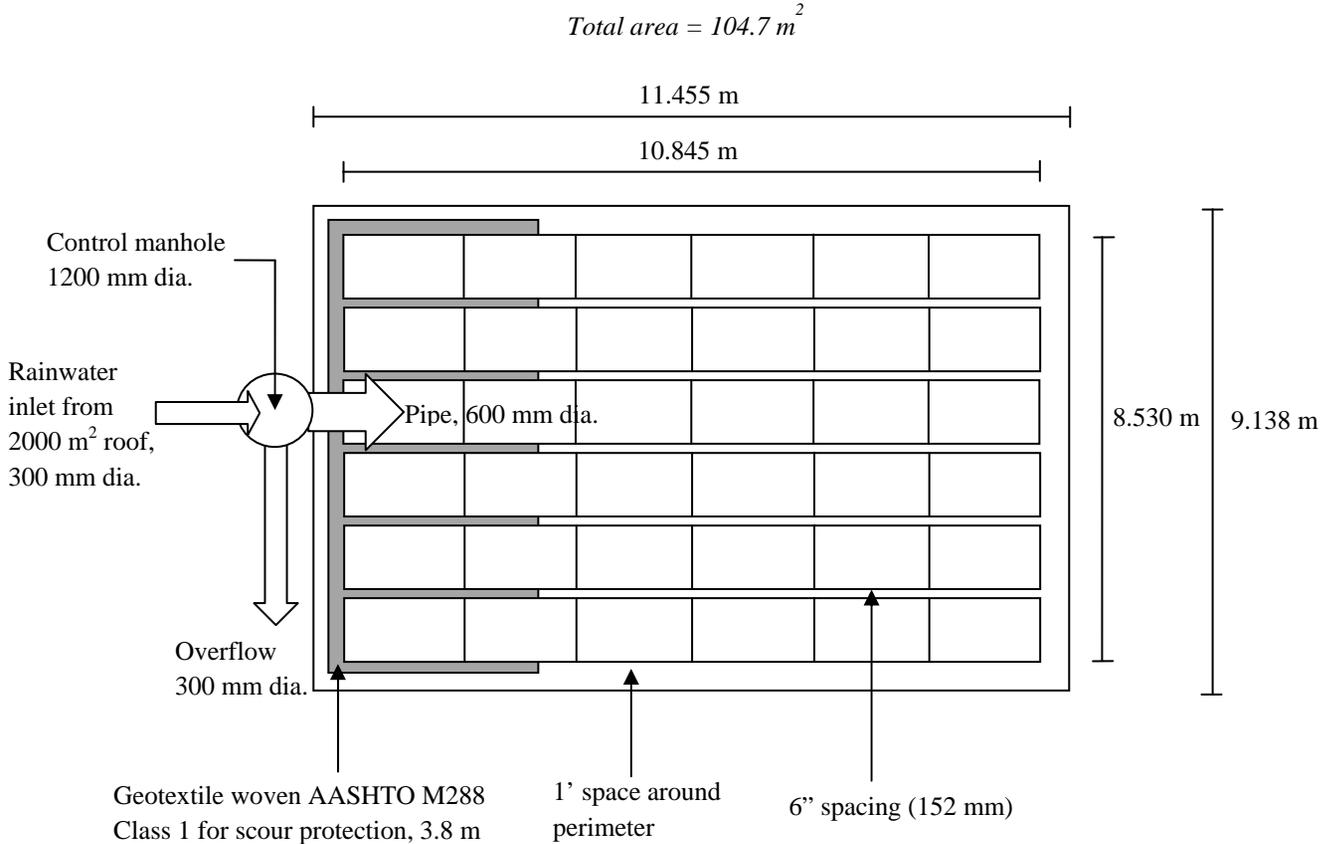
Plan view of infiltration chambers receiving roof runoff only
